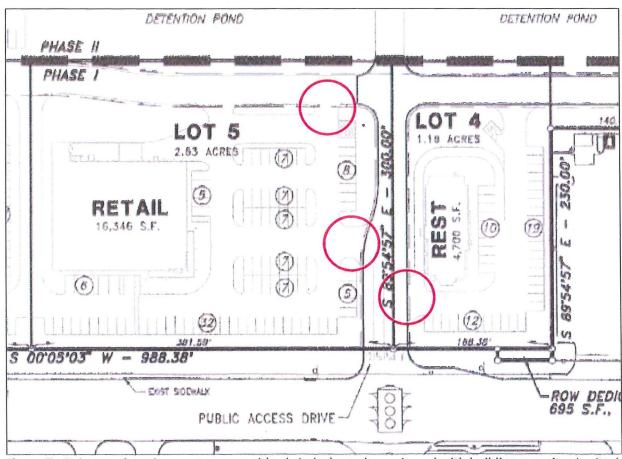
Driveway locations not approved (red circles) – to be reviewed with building permit submittal.
